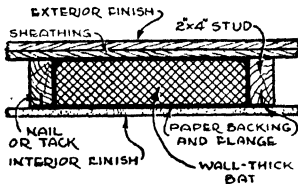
Application of Wall-Thick Flanged Bats Between 4" Studding
